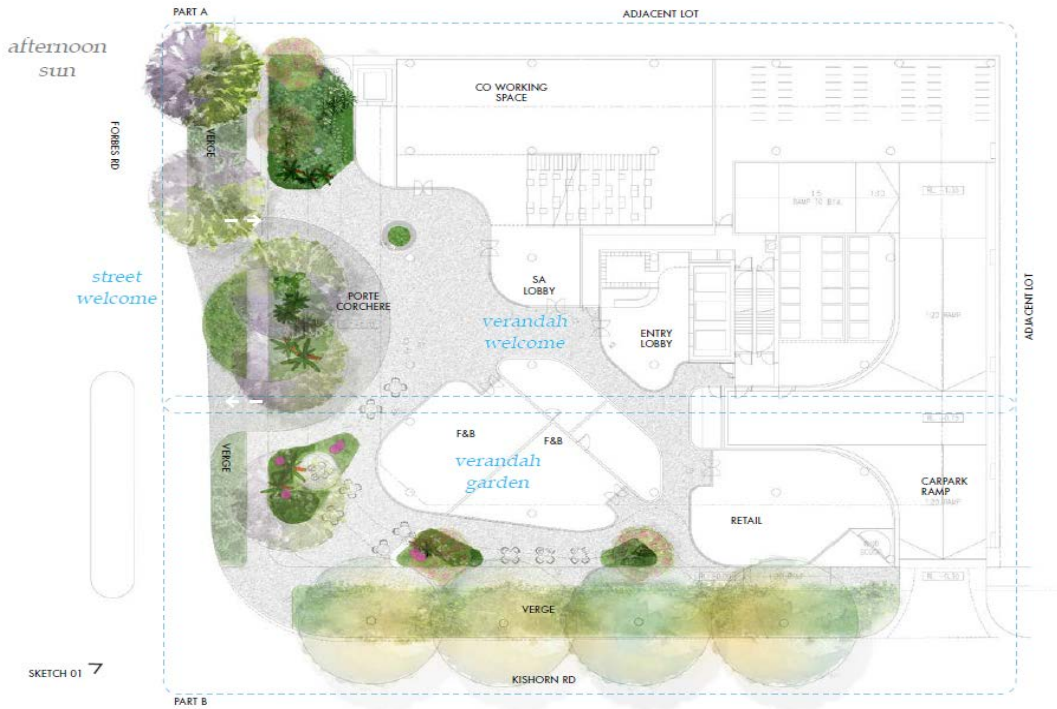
Original landscaping plan presented at August Canning Bridge Design Review Panel Meeting
